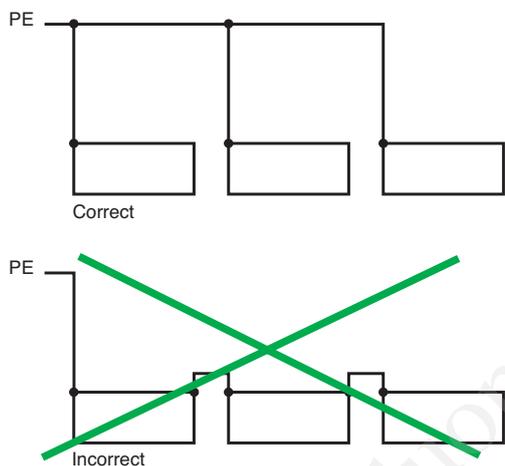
A poor connection in a series arrangement will leave all downstream appliances unprotected
